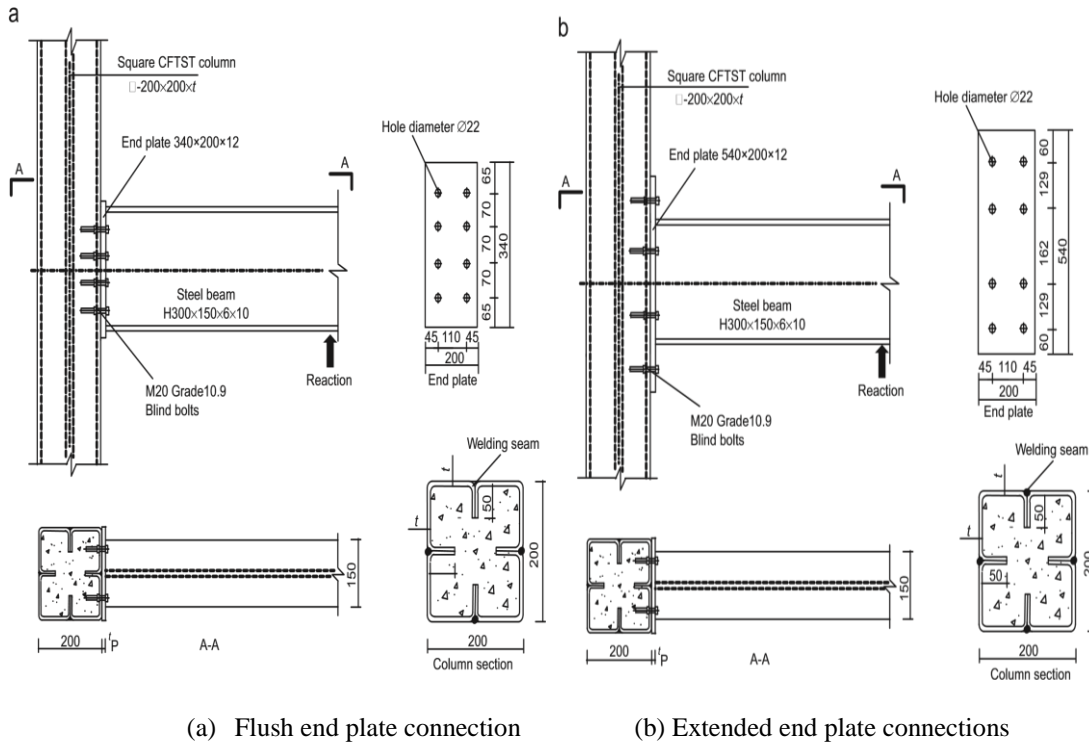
Design Details of Test Specimens (Wang and Guo 2012)
